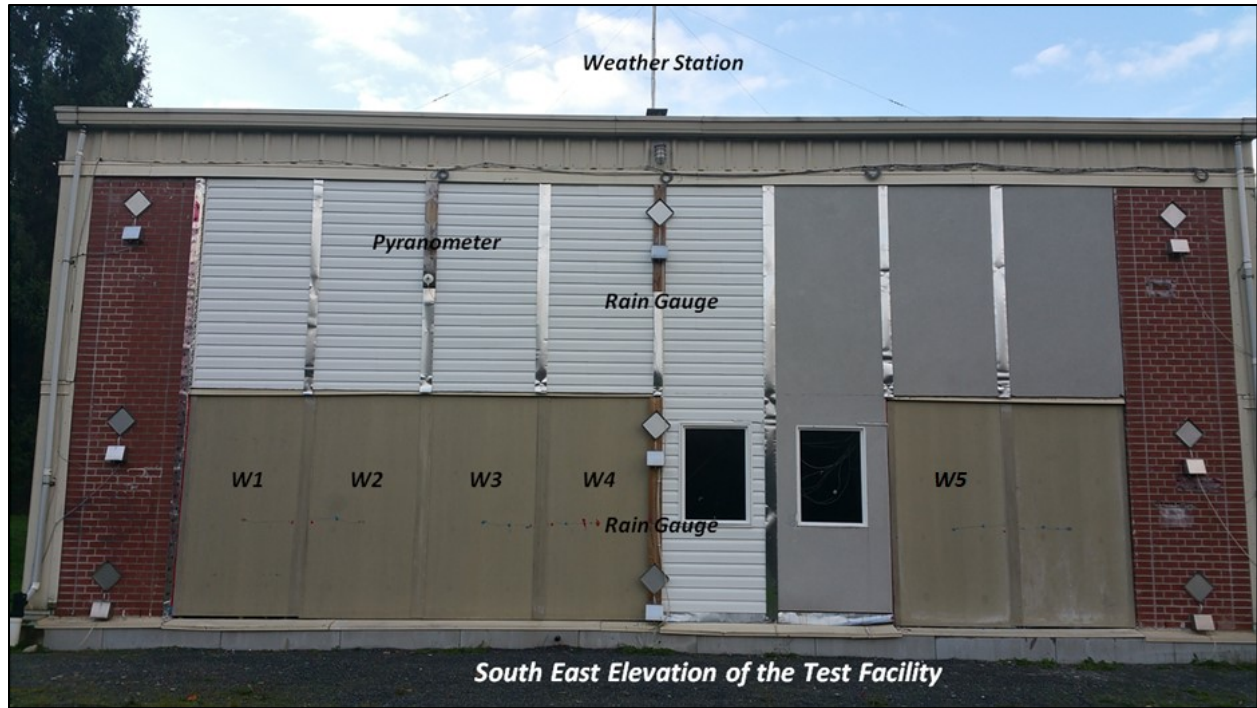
Building Envelope Test Facility (BETF), SE Elevation (photo by author)
